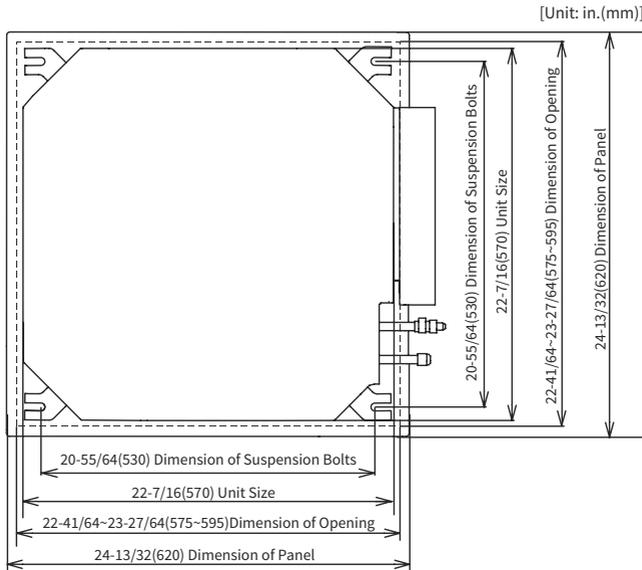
Opening of False Ceiling and Suspension Bolts
